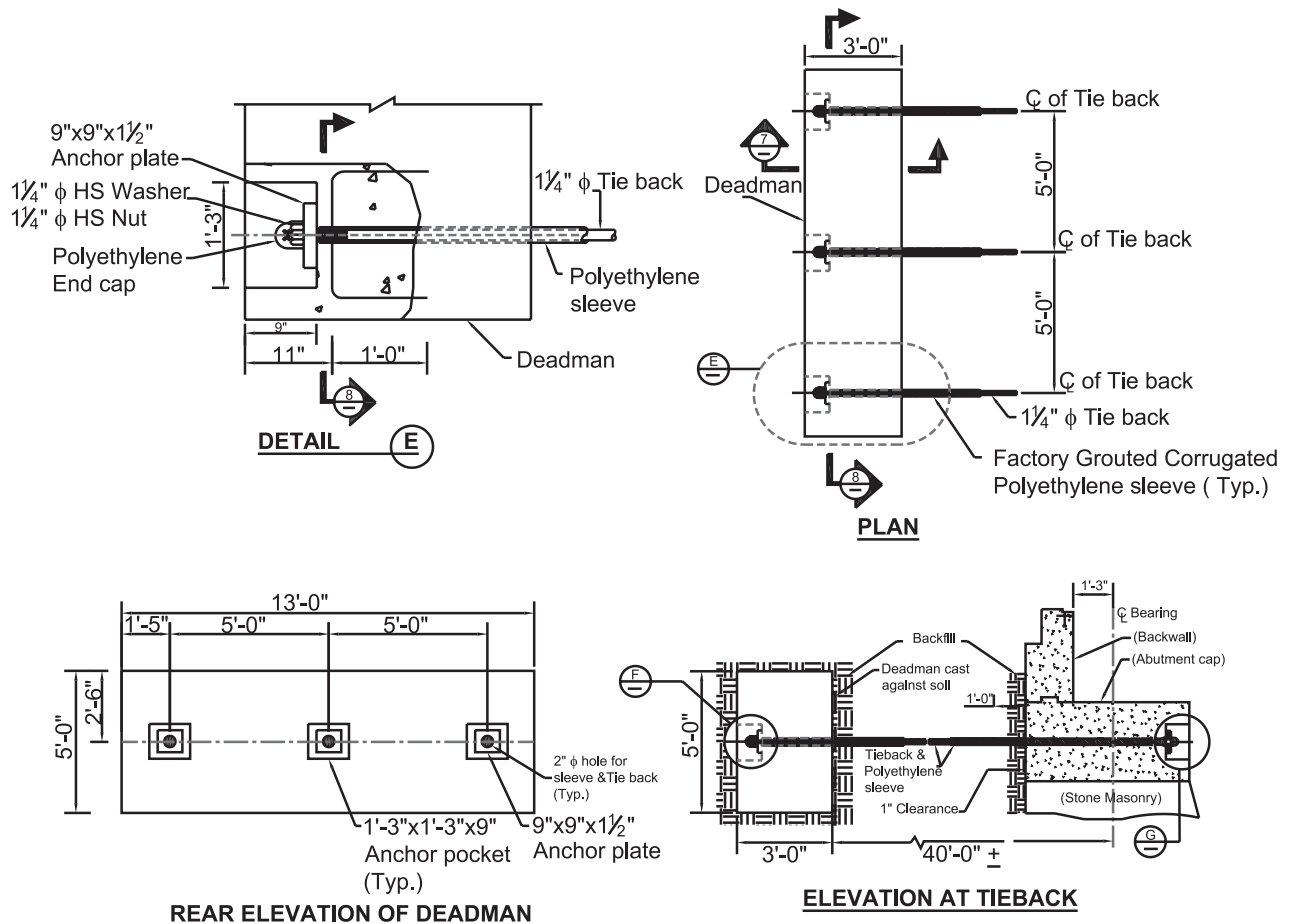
Example of strengthening of existing abutment by use of tieback.
